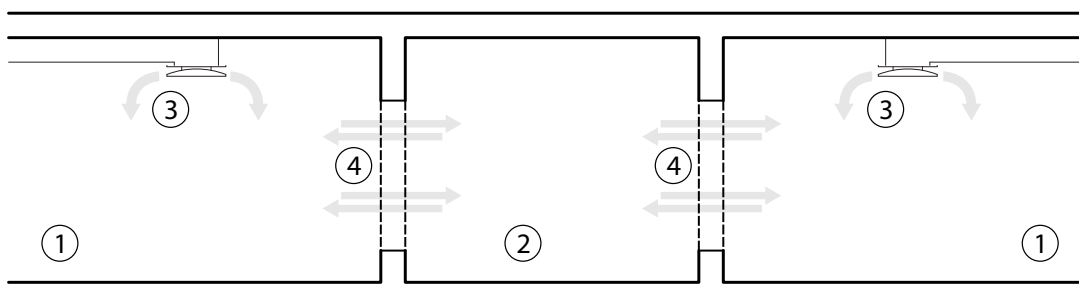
Interior ventilation wall. (1): Continuous use room. (2): Occasional use room. (3): Conventional ventilation system. (4): Activated flux ventilation wall.
